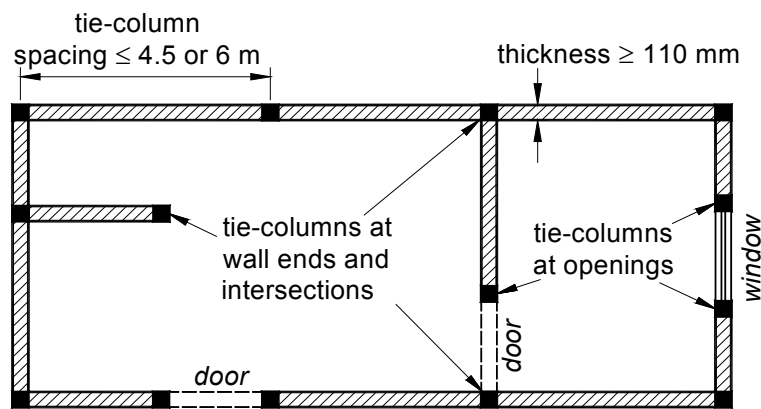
Typical floor plan illustrating the placement of RC tie-columns (Brzev, 2008).
